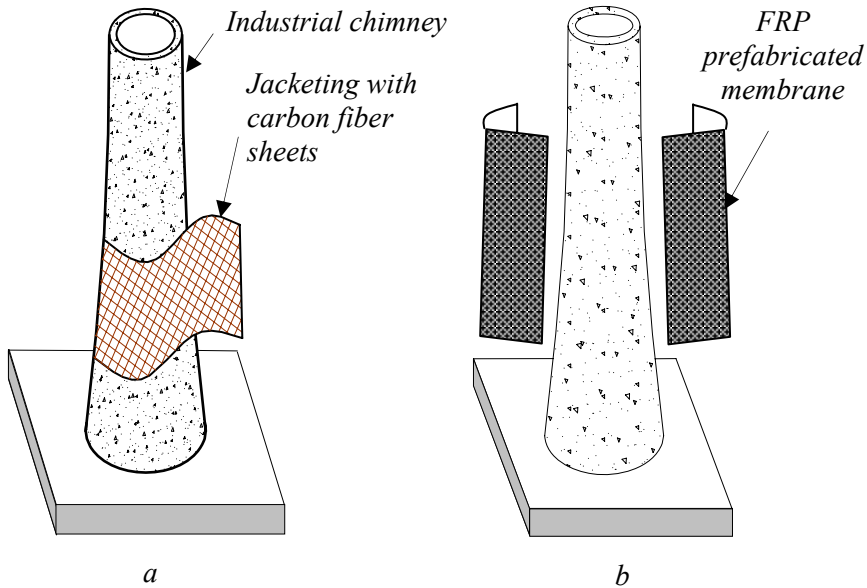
Concrete chimney confined with: a) FRP sheets; b) FRP membranes
